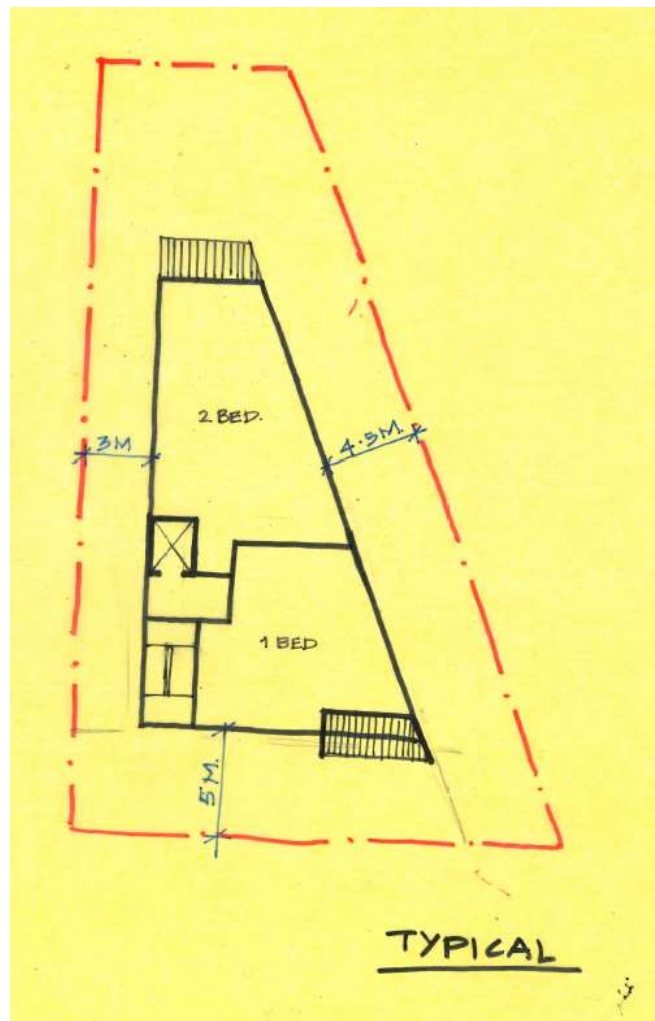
Indicative floor layout of 42 Gover Street, Peakhurst
